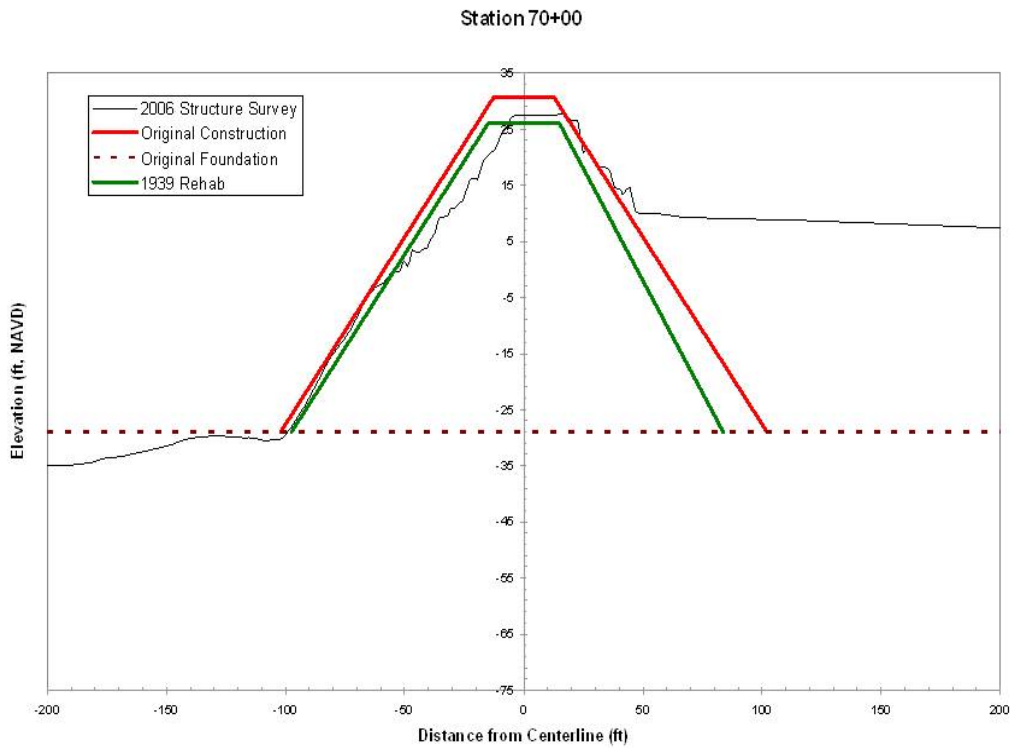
109. North Jetty Cross Section Templates - Trunk
